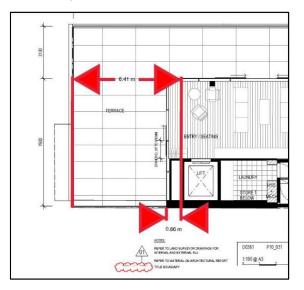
marked up (dimensions added) version of P10_030 (proposed level 4 plan) (Source: applicant; dimensions added by Council)
